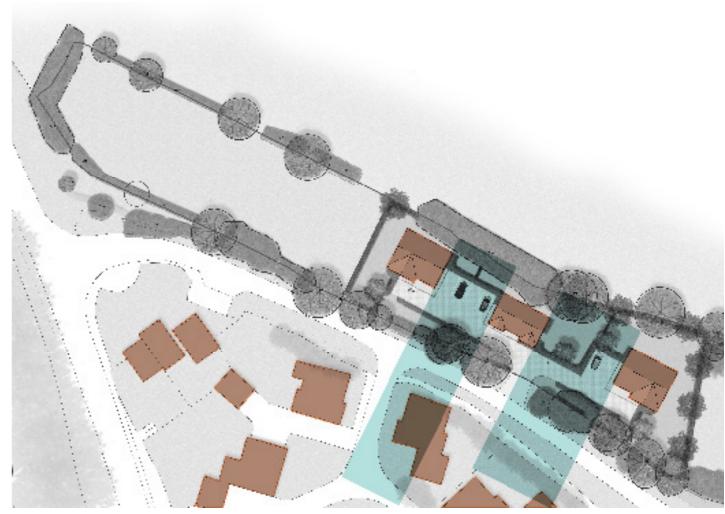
Relationship between gaps in proposed dwellings to existing Crest houses
